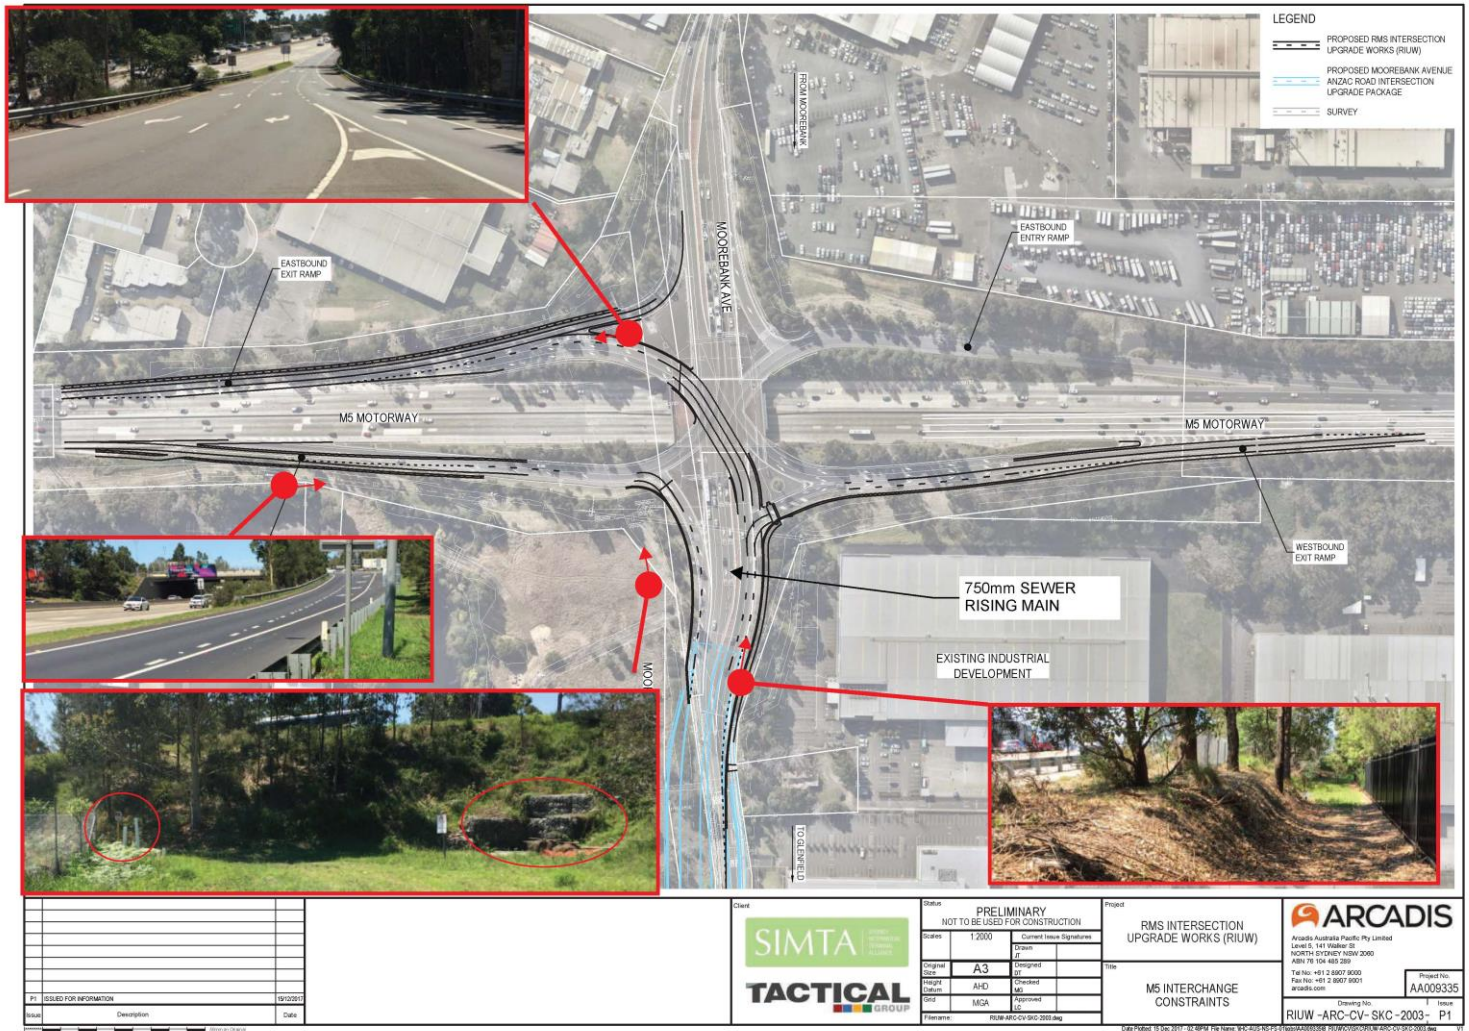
Indicative Layout Plan - Moorebank Avenue Road Upgrade near M5
